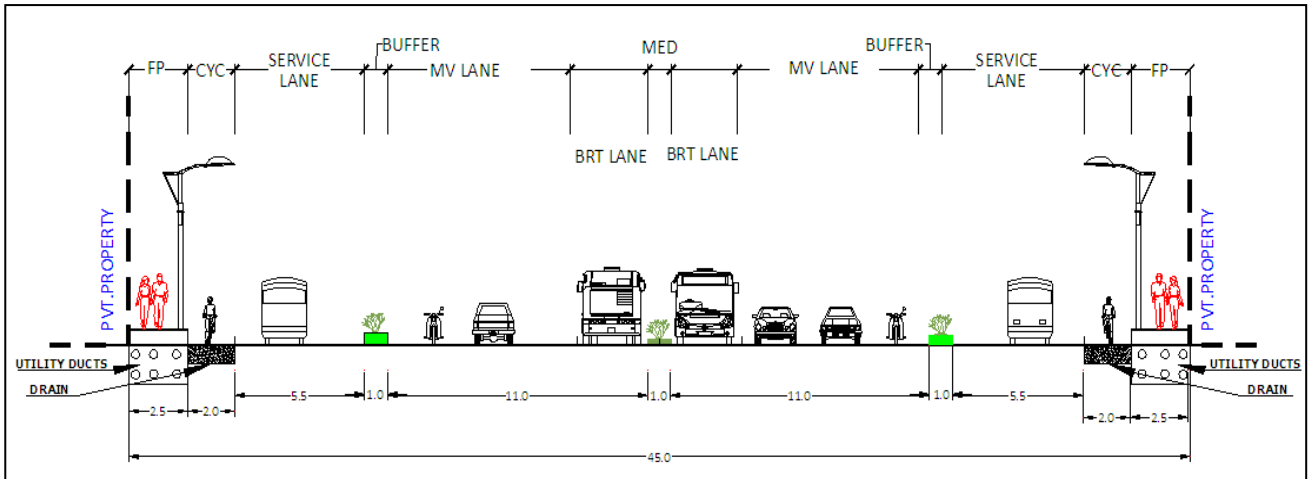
Arterial Road Cross- Section (RoW- 45m)
